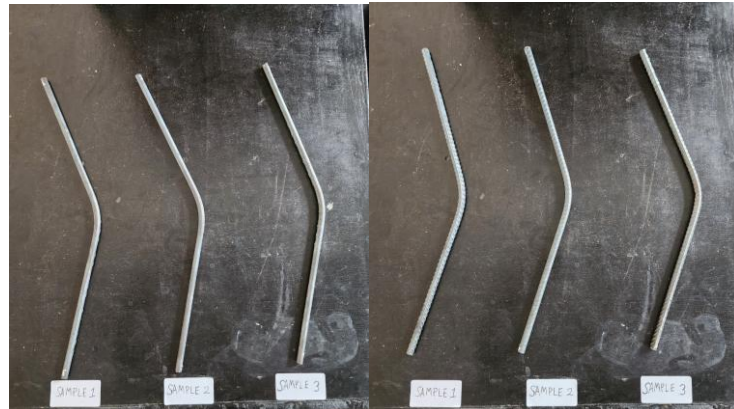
Specimen Condition After Bending Test: Plain Reinforced Concrete (Left) and Deformed Reinforced Concrete (Right)
